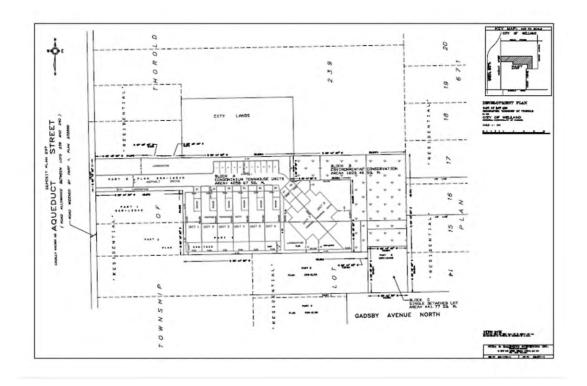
Final Development Plan, prepared by Joe Tomaino for Lucchetta Builders Inc.
